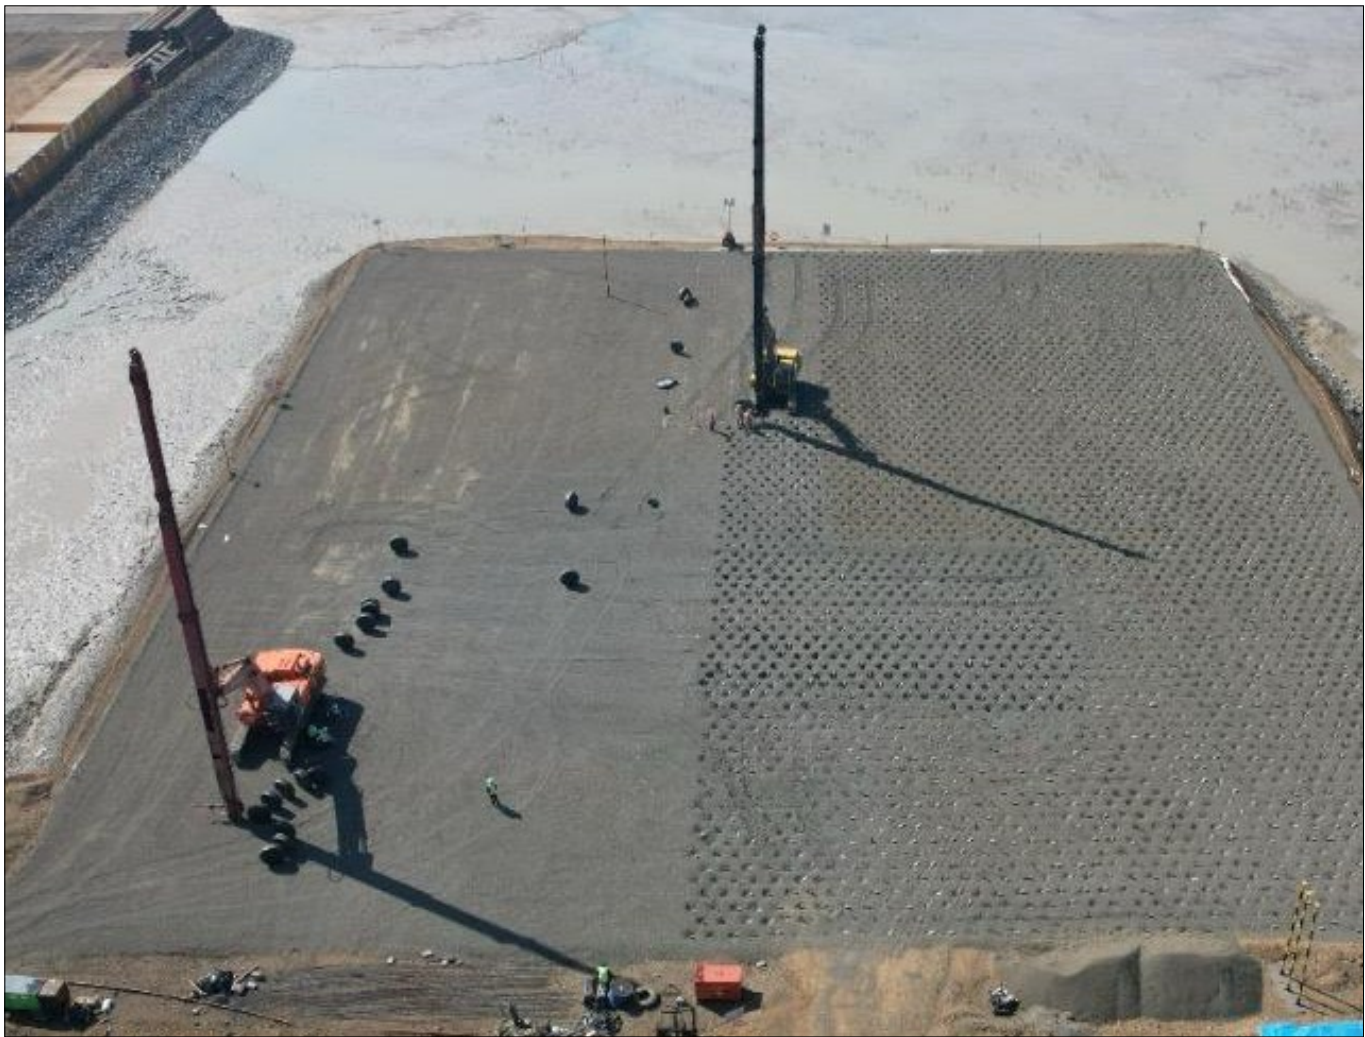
Final Surface Preparation of Container Yard with Concrete after PVD Installation
